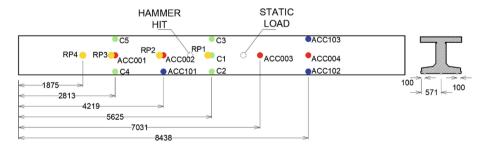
Layout of accelerometers, bottom view and section of the beam. Dimensions in mm
